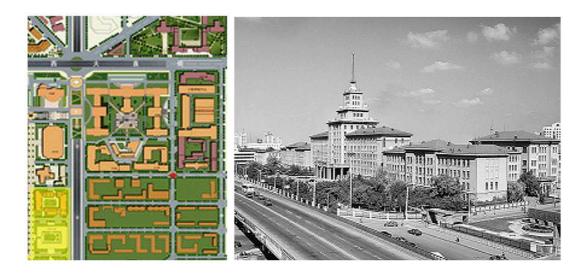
The Site Plan of the Main Building of Harbin Institute of Technology
